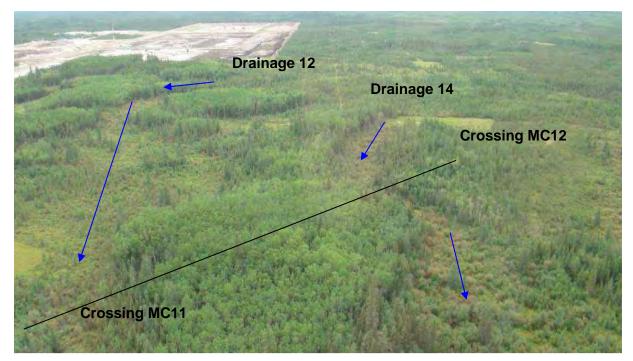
Drainage 12 and 14 looking west at proposed crossing sites MC14 and MC11
